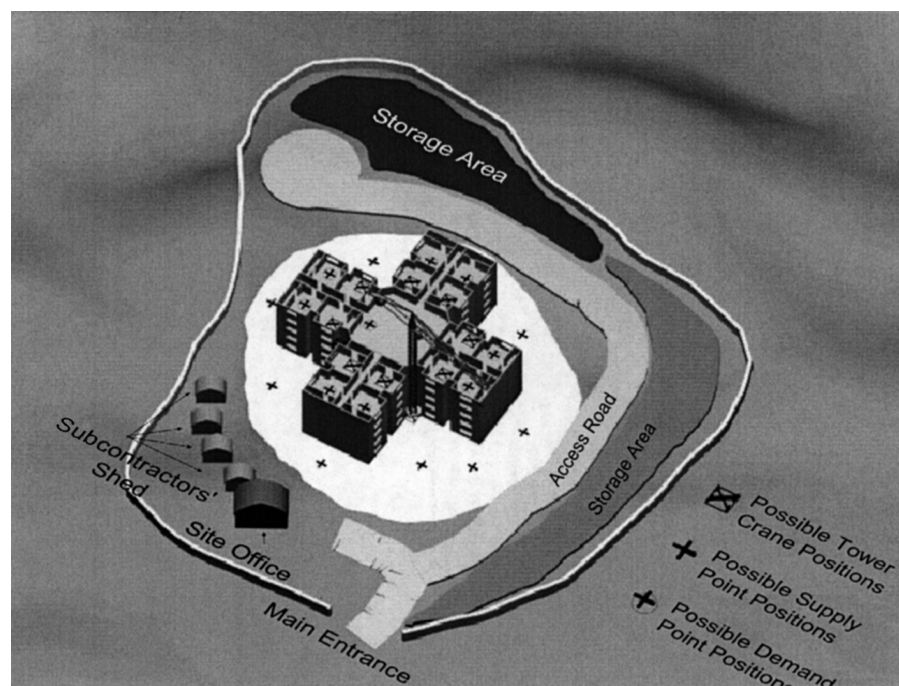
Side View of Possible Supply and Tower Crane Positions, Demand Points
